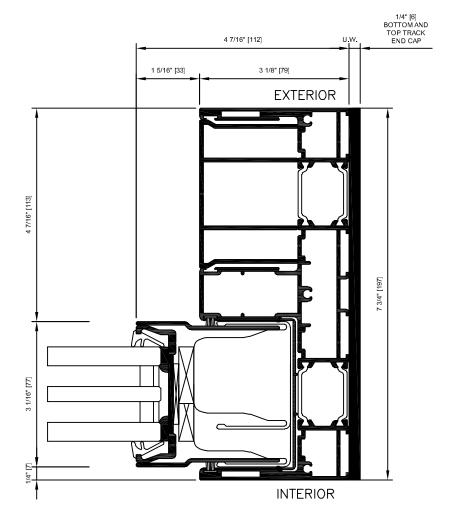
Side Jamb with Sliding Panel and Single Lock Stile with Handle
